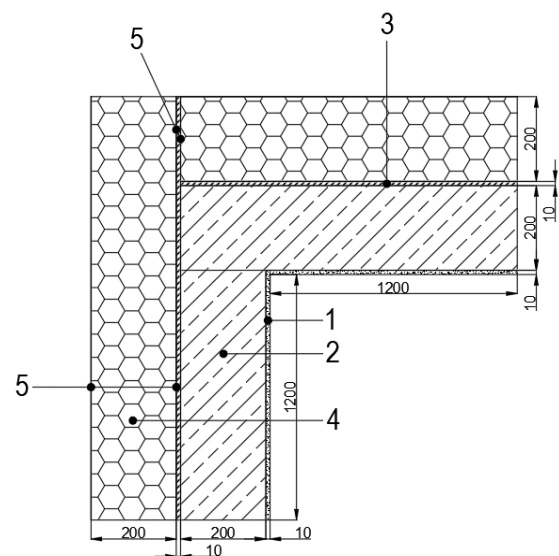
Wall corner fragment: 1 – plaster, 2 - aerated concrete blocks, 3 – PU foam, 4 – PIR insulation, 5 – PIR facings (see Table 1) (dimensions in mm).
